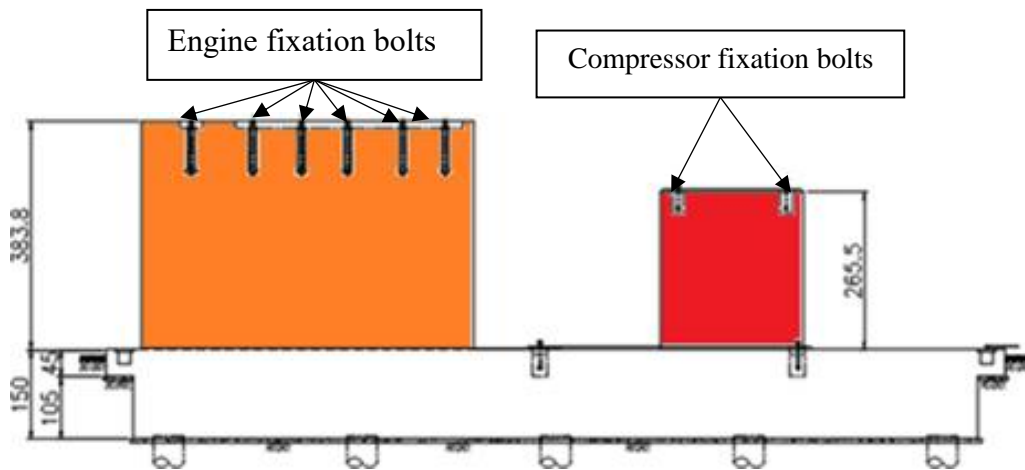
A-A View from de concrete foundation (dimensions in centimeters).
